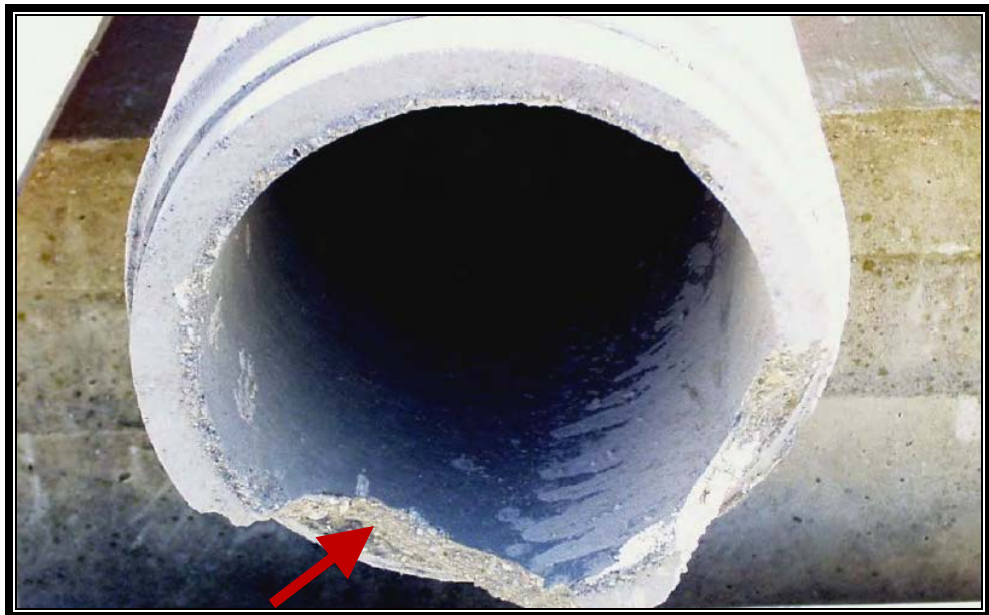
Chipped and Damaged Spigot End of Reinforced Concrete Pipe – Not Acceptable
